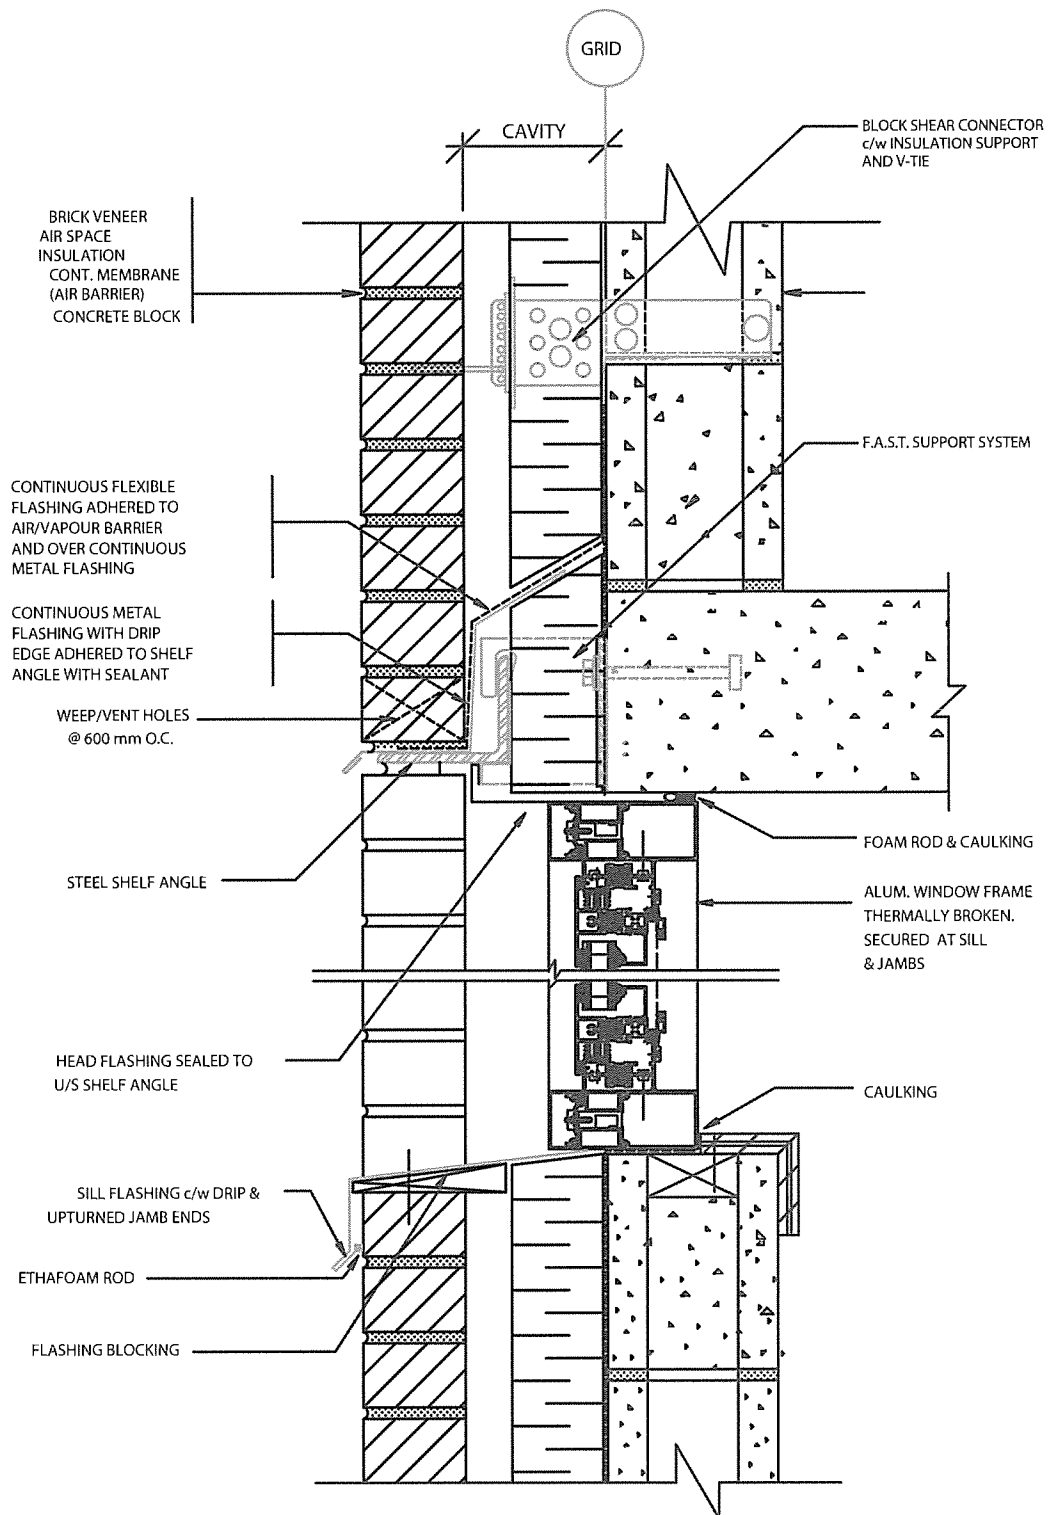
BRICK VENEER / CONCRETE BLOCK - WINDOW HEAD & SILL DETAIL
